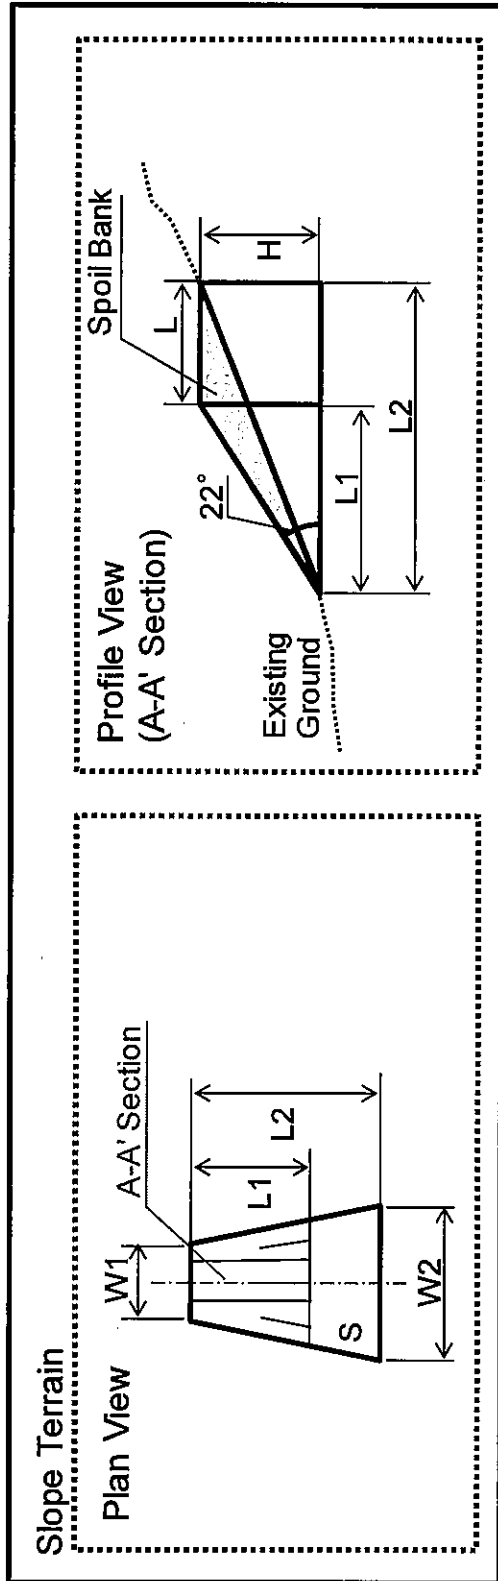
Plan for Locations of Spoil Bank (Hnathial Bypass) -3/3
